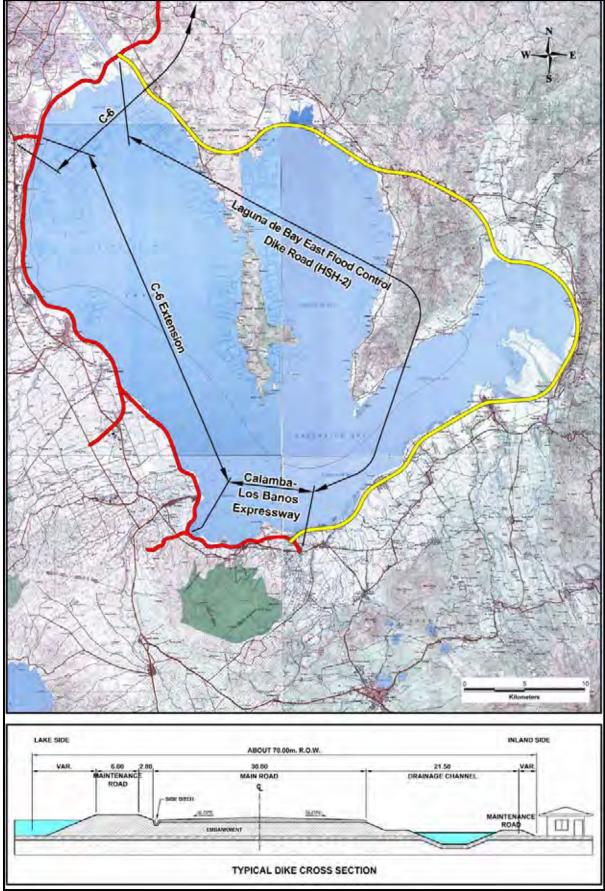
LAGUNA DE BAY EAST FLOOD CONTROL DIKE ROAD
